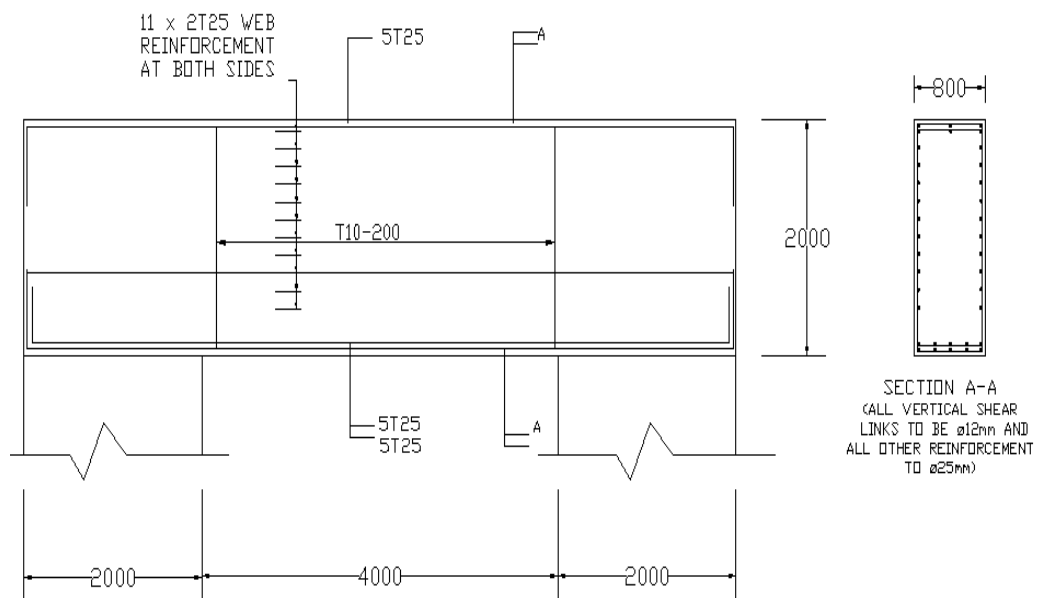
Detailing of transfer beam in longitudinal and cross section view (not to scale).
